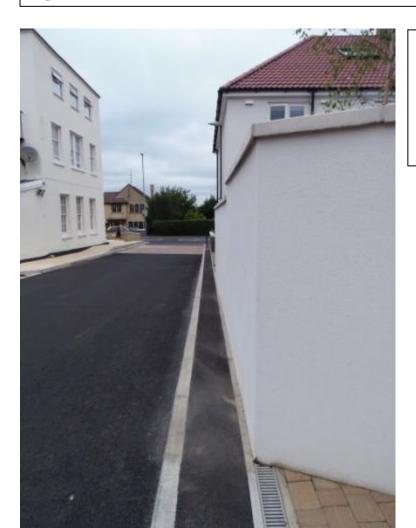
Shoulder-width pavement makes the construction of it seem unnecessary
